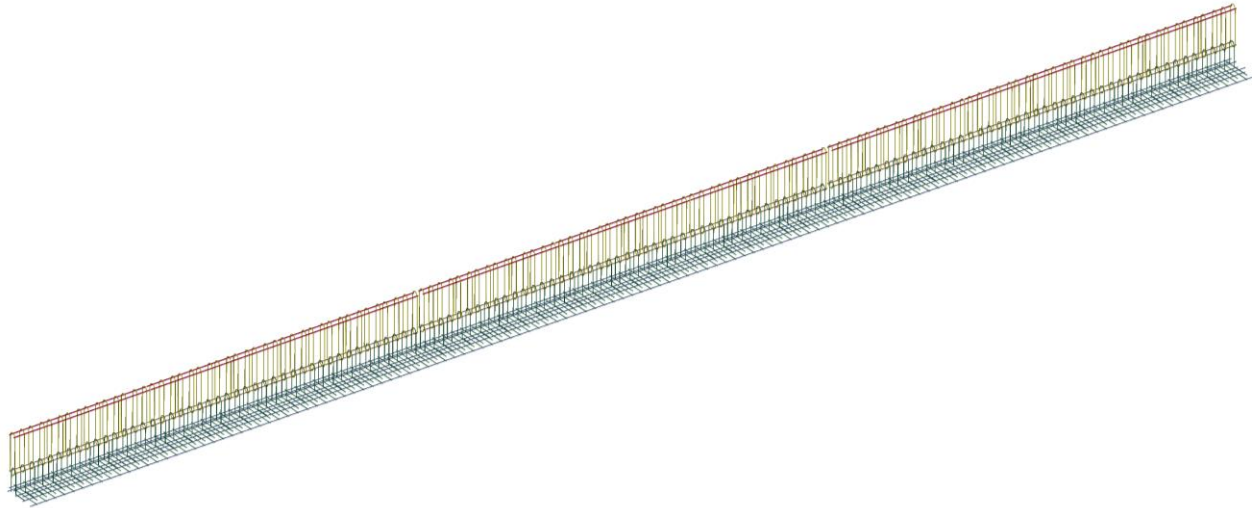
Steel reinforcement bars inside the Classic Rail.
